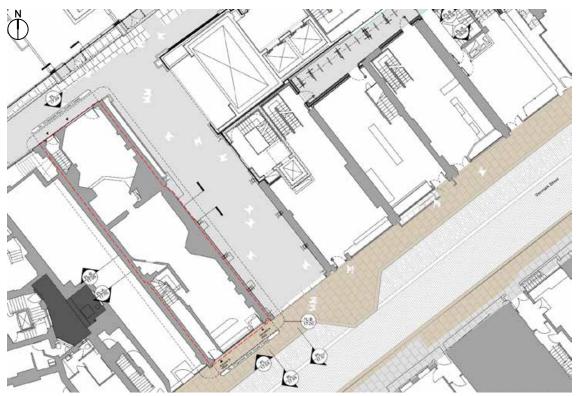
Plan of consented scheme, the application site outlined in red (Orms)
